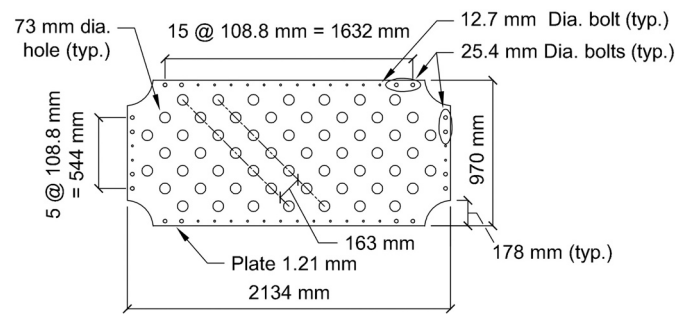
Detail of the first-story perforated infill panel of the NZP specimen.
